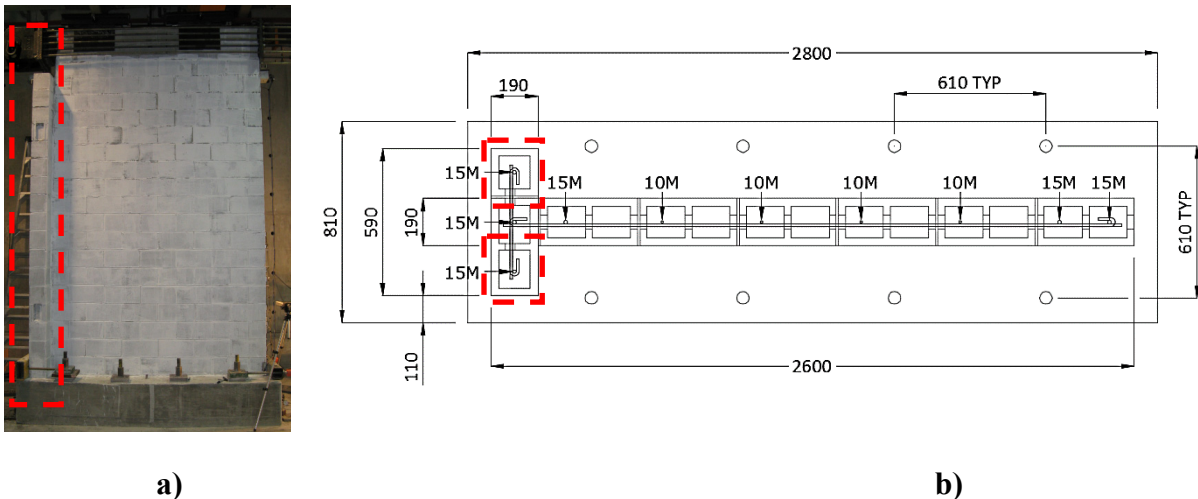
Flanged boundary elements of specimens W6 and W7: a) elevation and b) plan.
